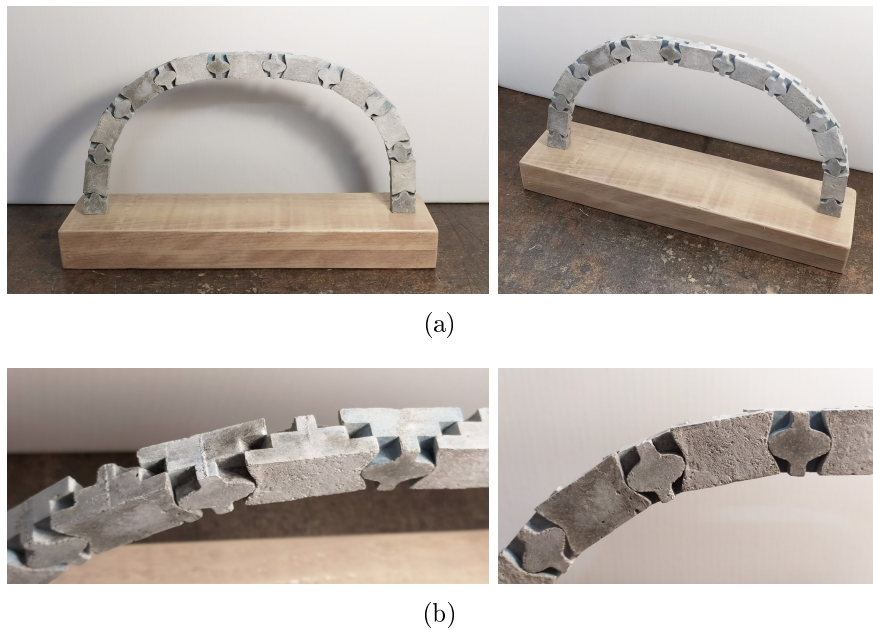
Applications to architecture: a small-scale flex-ten triumphal arch. (a) Front and 3/4 views of the arch, made of concrete; (b) detail of the segments.
